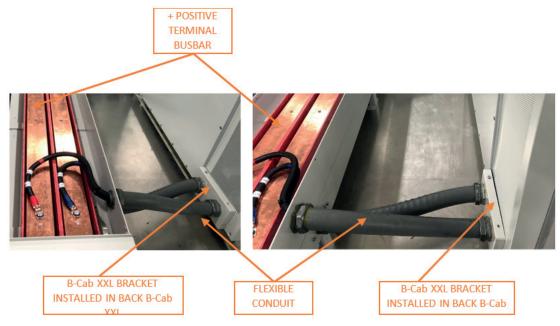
B-Cab XXL to C-Trough Flexible Conduit Installation.
